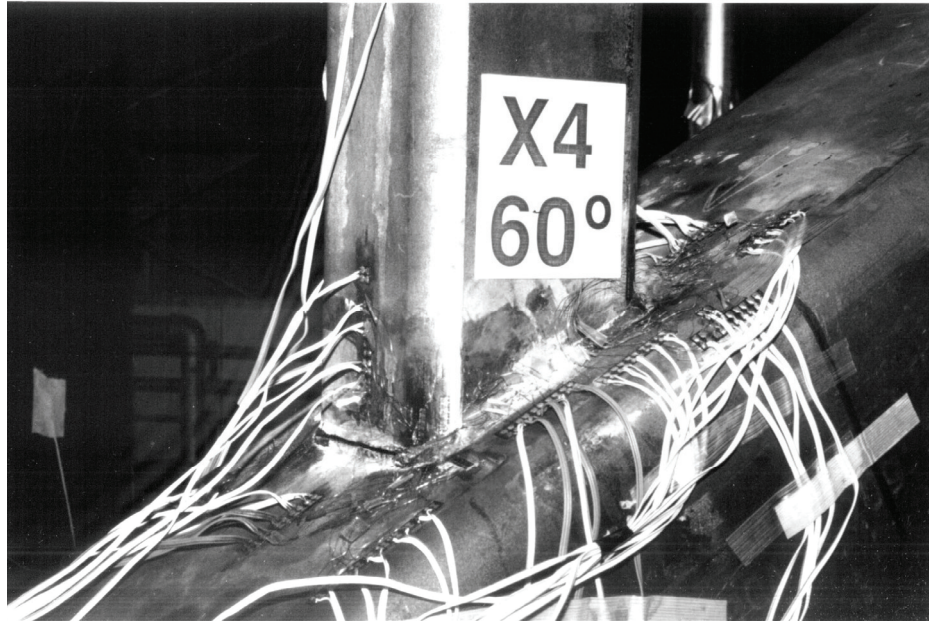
Laboratory testing of rectangular HSS cross- (or X-) connections, with failure of the welds.
